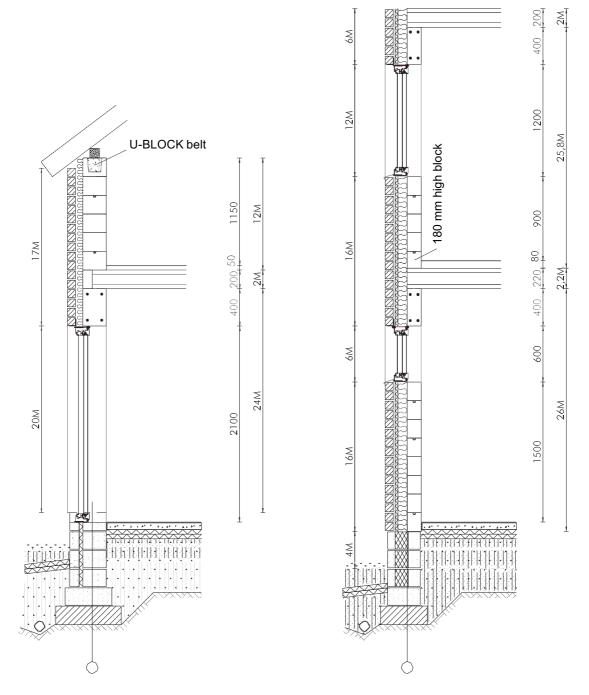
b. bauroc wall vertical module measurement lined wall
